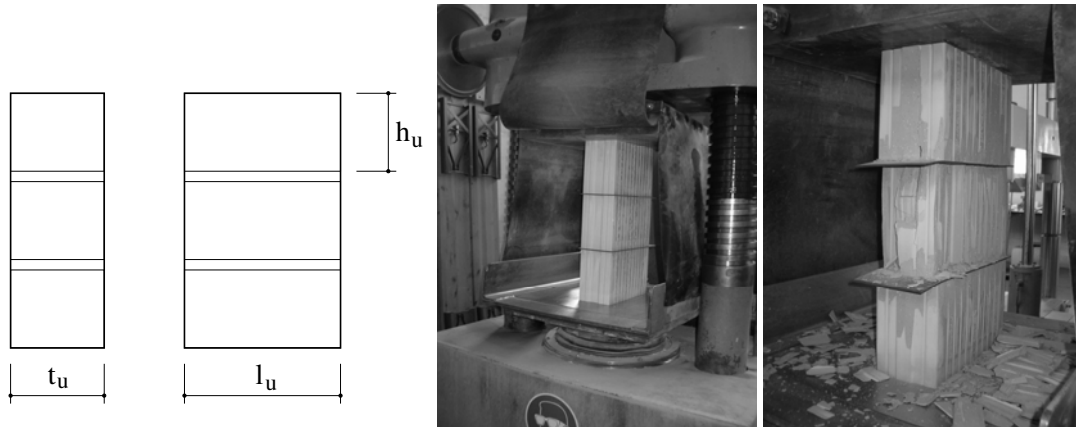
Three-Unit Test: Test Specimen, Test Set-up and Typical Failure
